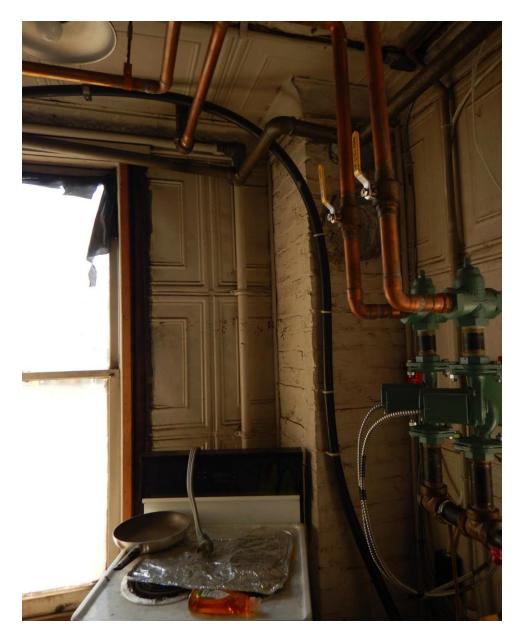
FIRST FLOOR MECHANICAL ROOM FACING EAST
